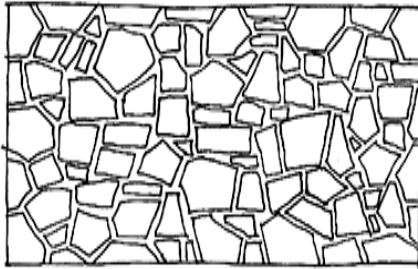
Concrete masonry patterns (Beall, 1987: 359)
